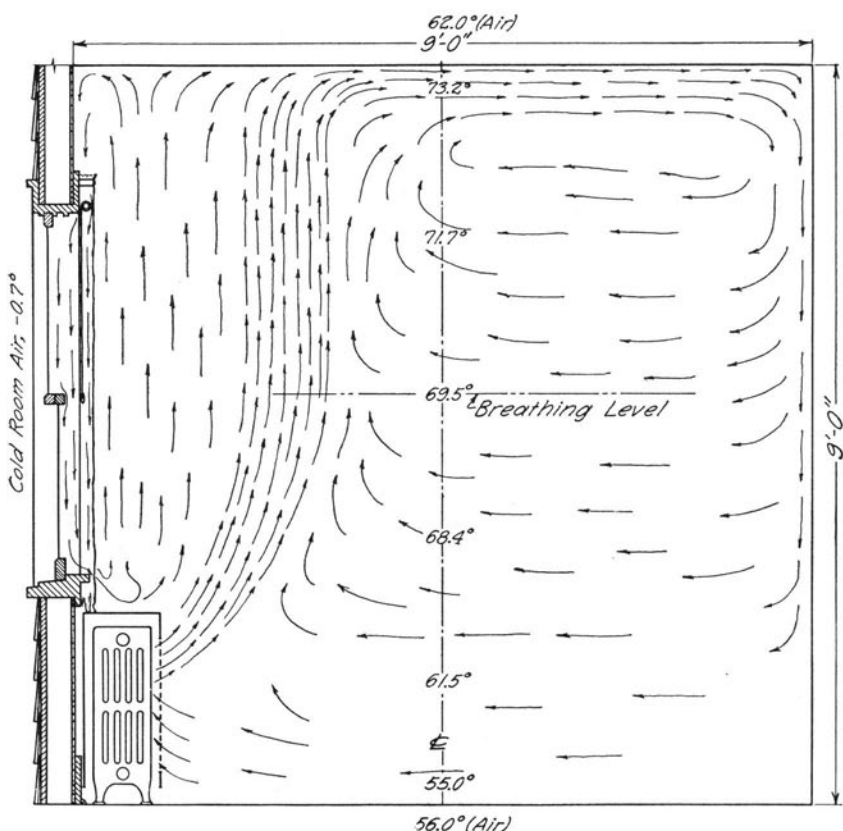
AIR CIRCULATION IN WEST TEST ROOM (SECTION A-A, FIG. 1) WITH ENCLOSURE NO. 3
